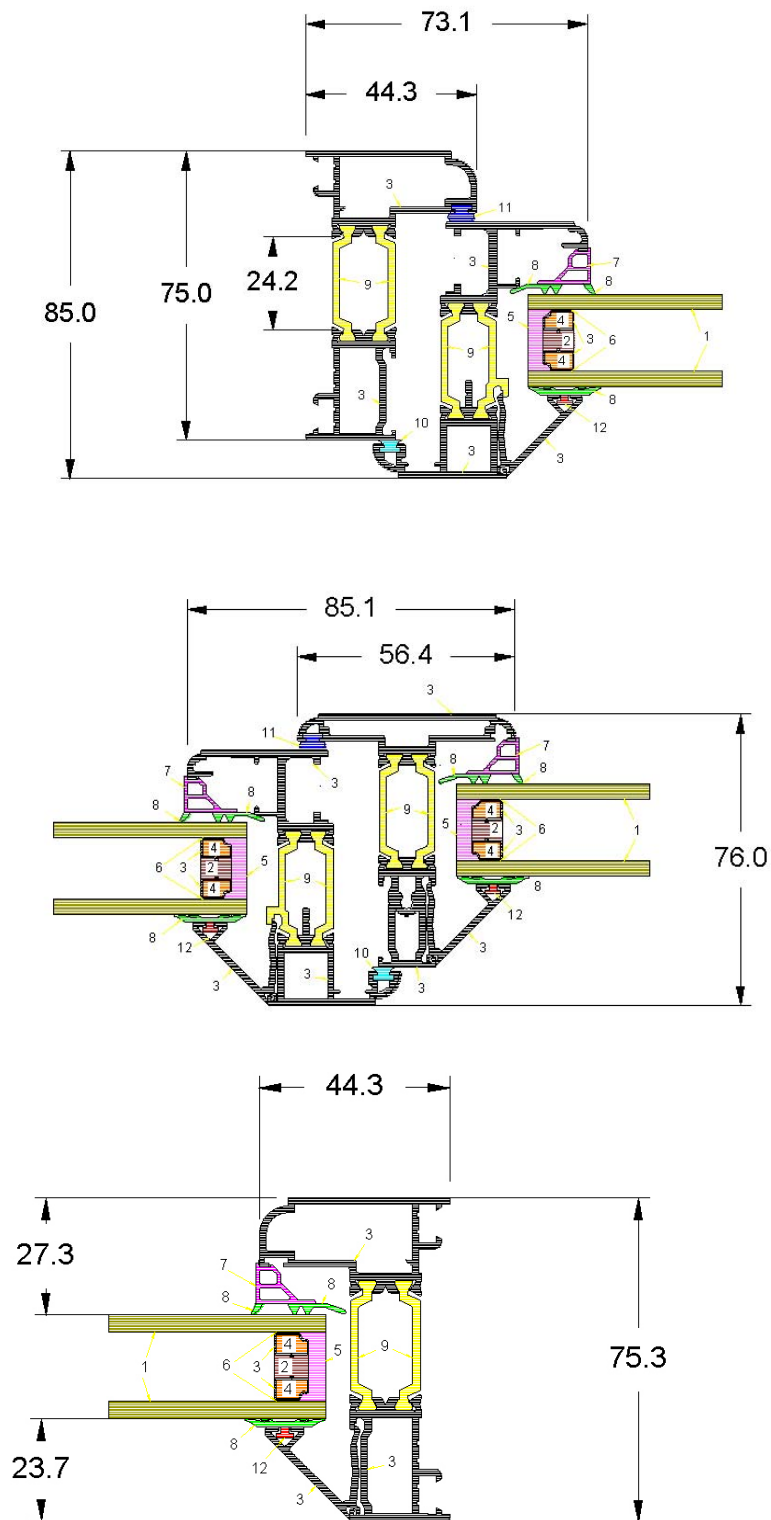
Section drawings of the aluminium frame - 5 mm fill and debridge
